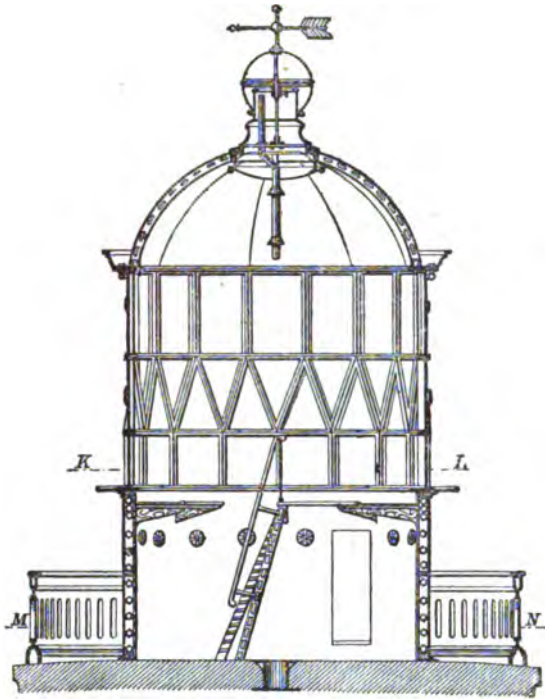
, a detailed section of the framing, and manner of securing the plate glass by gun-metal capping.
